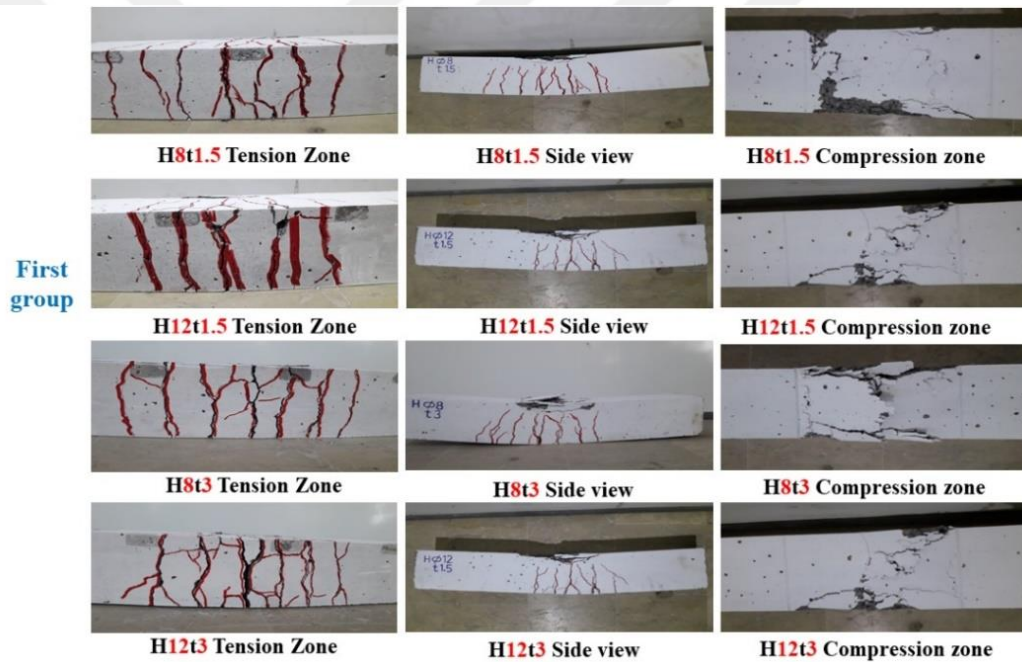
Patterns of the failures in the concrete beams (first group)
